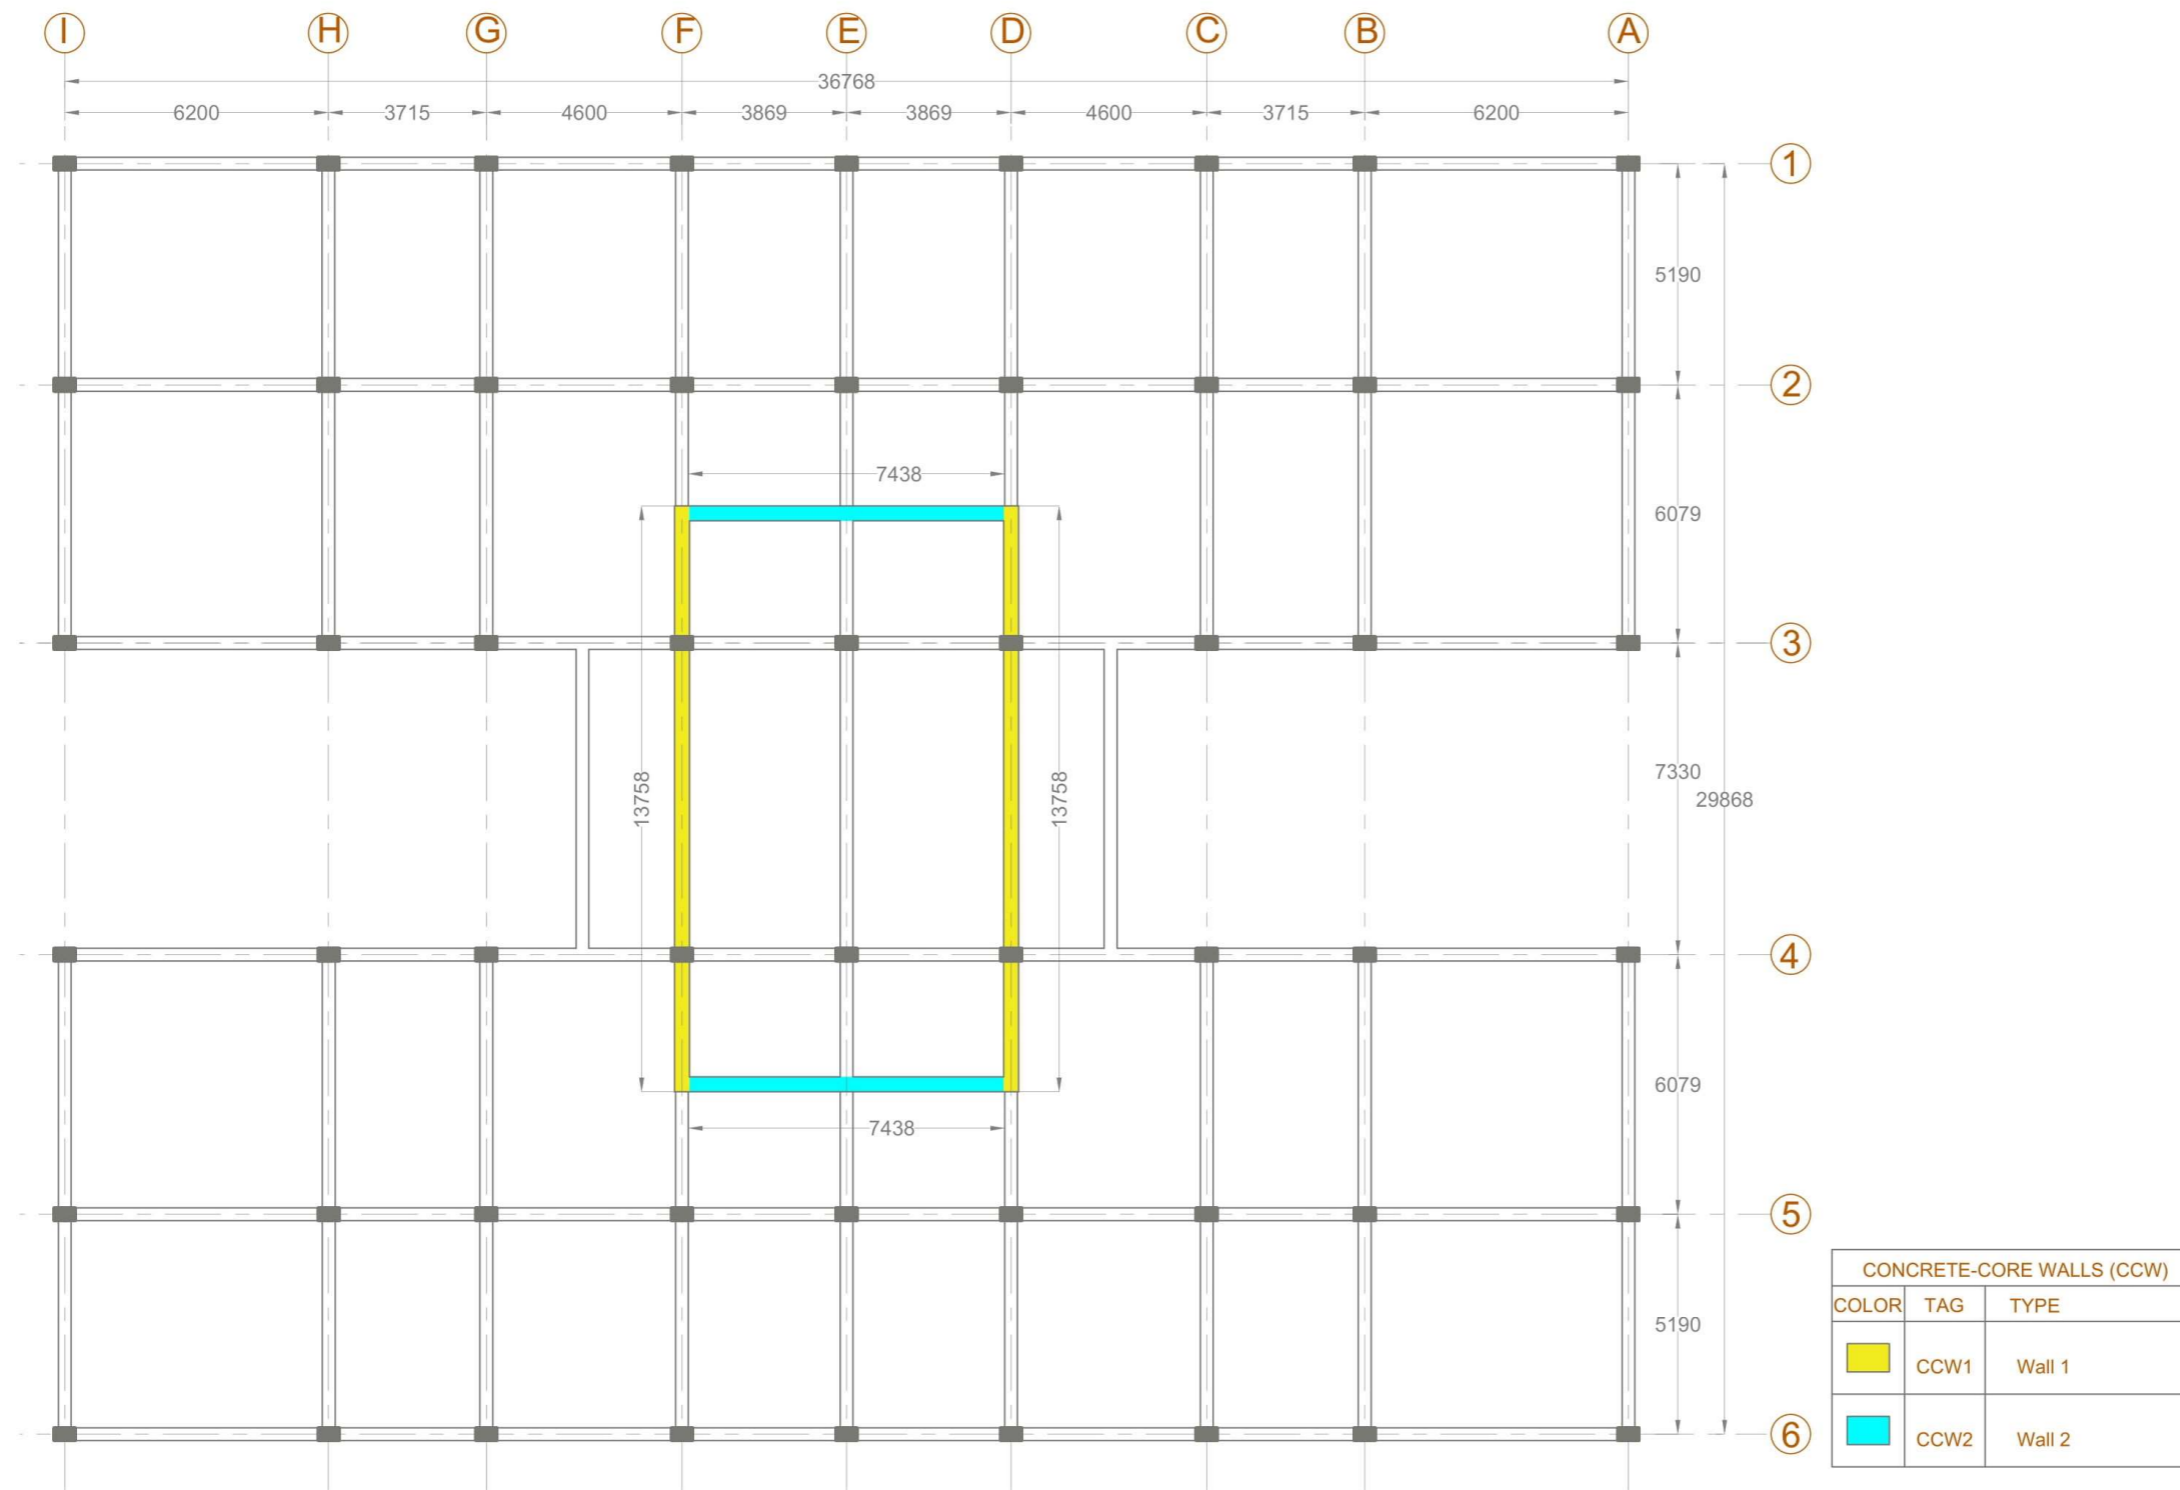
Concrete-core walls (Colour, Tag and Type)
